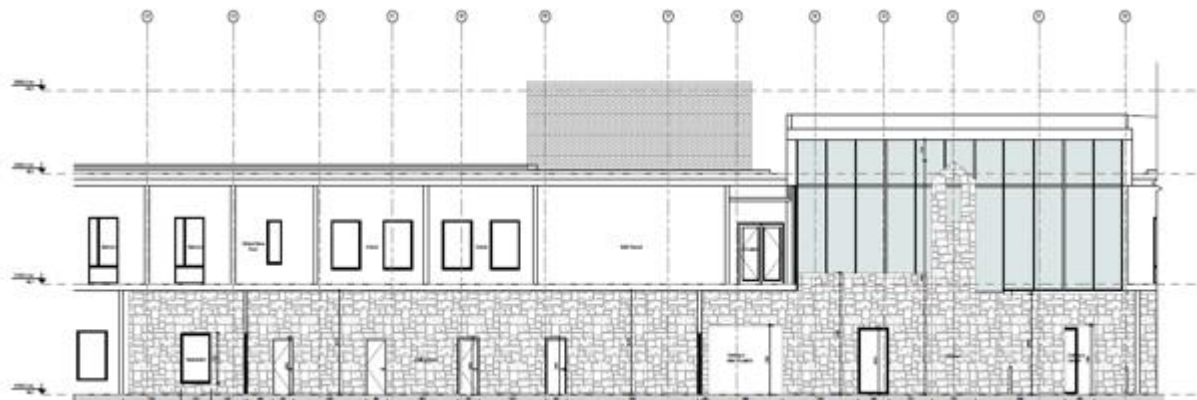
Proposed east elevation, Part 1. Source: TOT Architects
